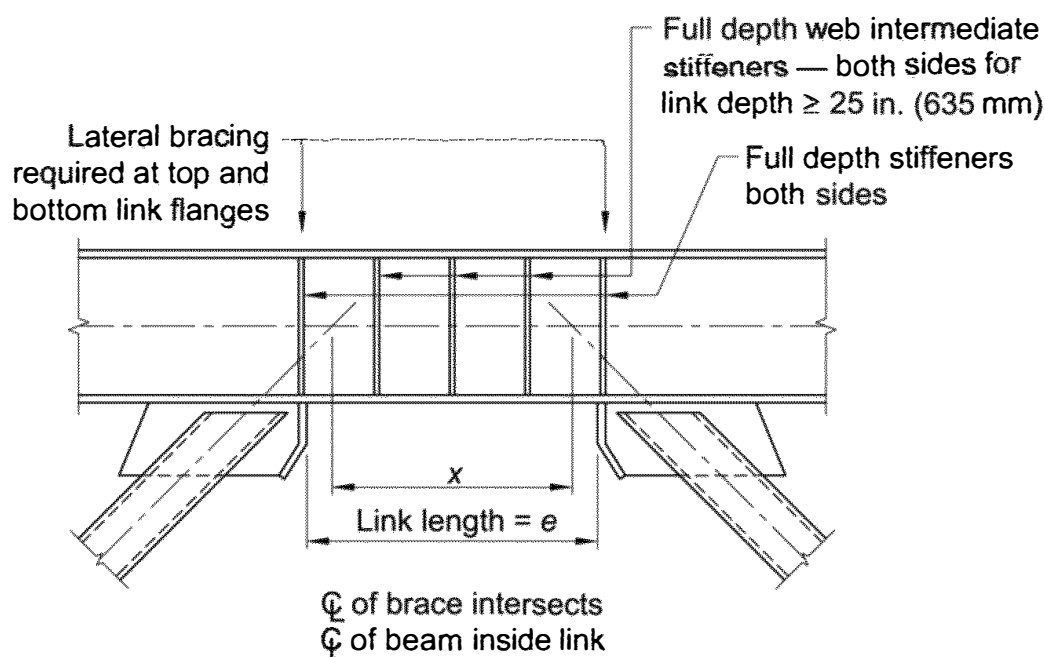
EBF with HSS bracing ($x < e$).
